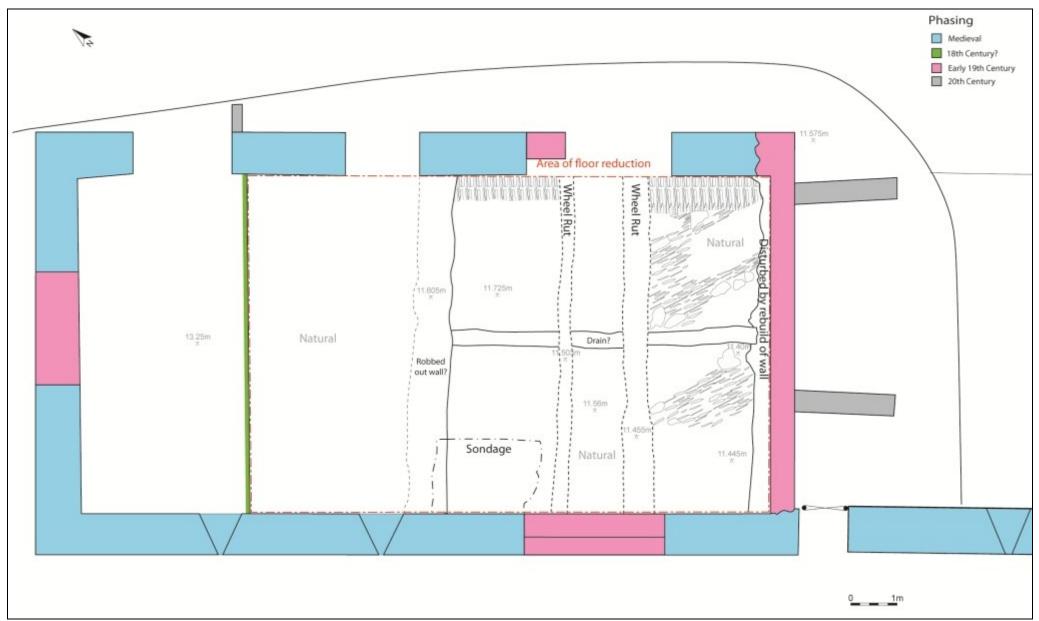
The earlier floor surviving of natural shillet with occasional patches of repair/infill.
